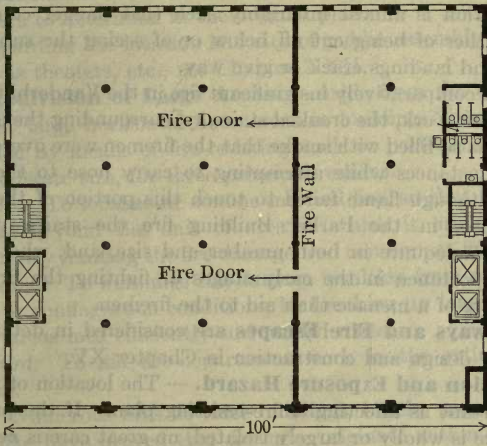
"Bi-sectional" Plan of Typical Loft Building.
